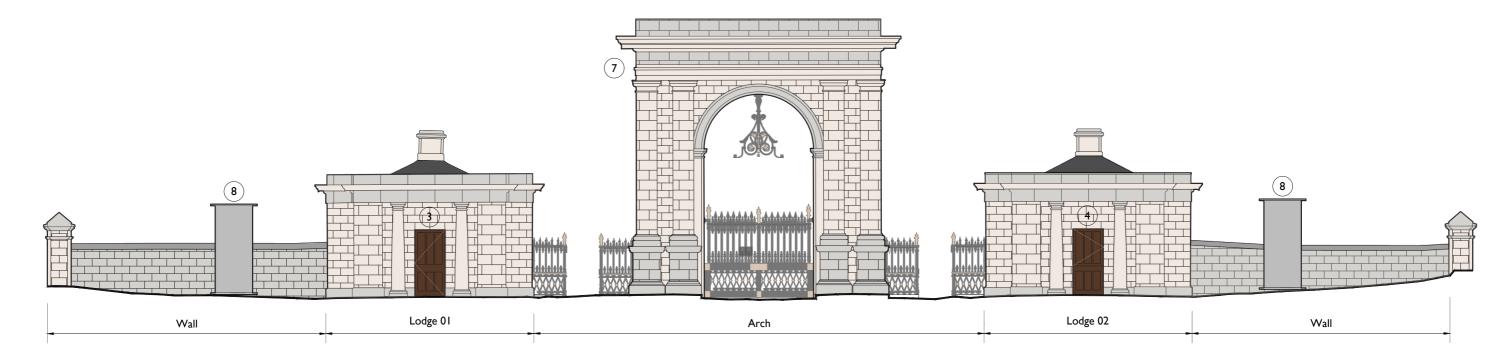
Extract of Architects Elevations looking from Wigan Lane. Ref drwg 239759-PUR-01-GF-DR-A-2621
